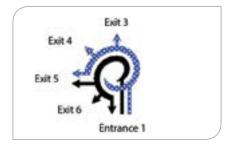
Sign on entry point 1, Av. La Constitución – TF5
